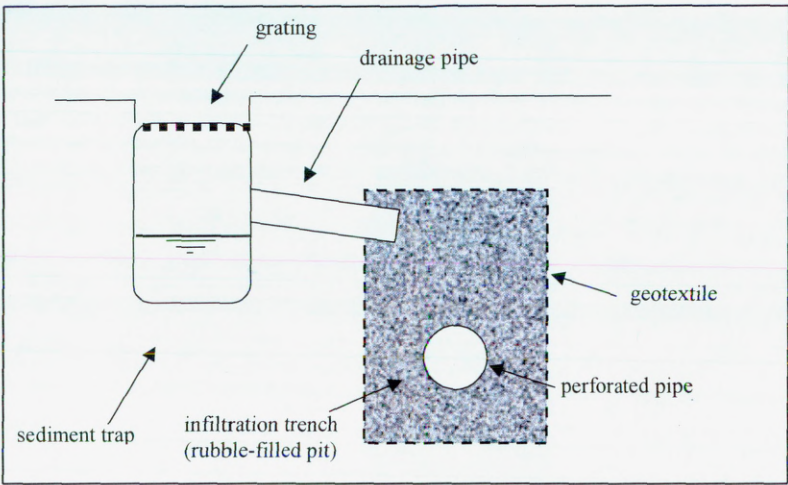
Schematic of a filter drain for road drainage (modified from Price, 1994)
